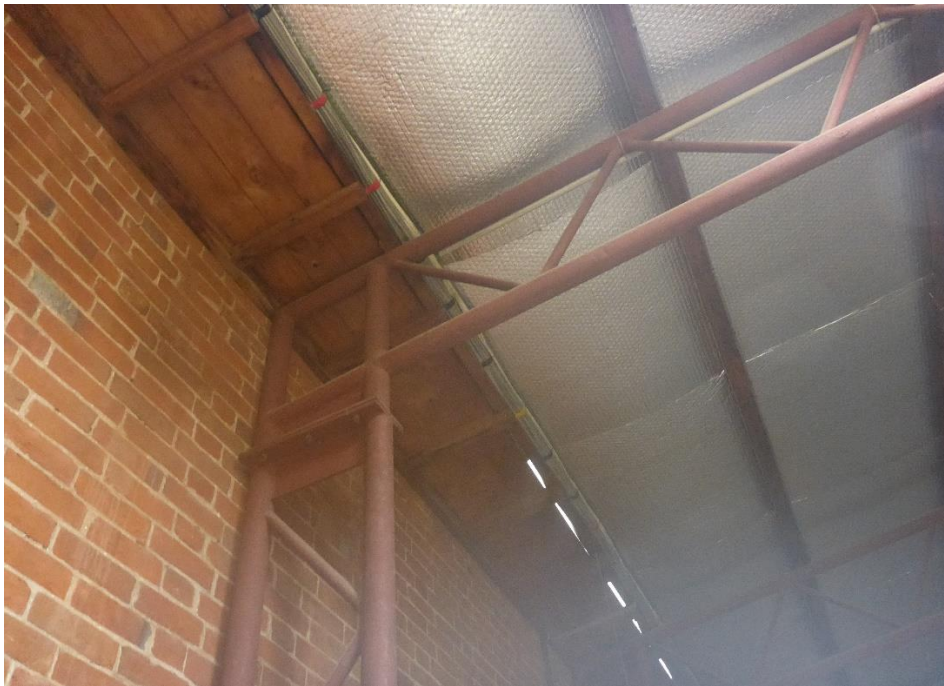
A detailed view of the contemporary steel portal frame that supports the skillion roof set over the warehouse / carparking space located at the rear of the subject site. The timber supporting structure for the roof's box gutter installation is also evident in this image. (Source: VAULT)
